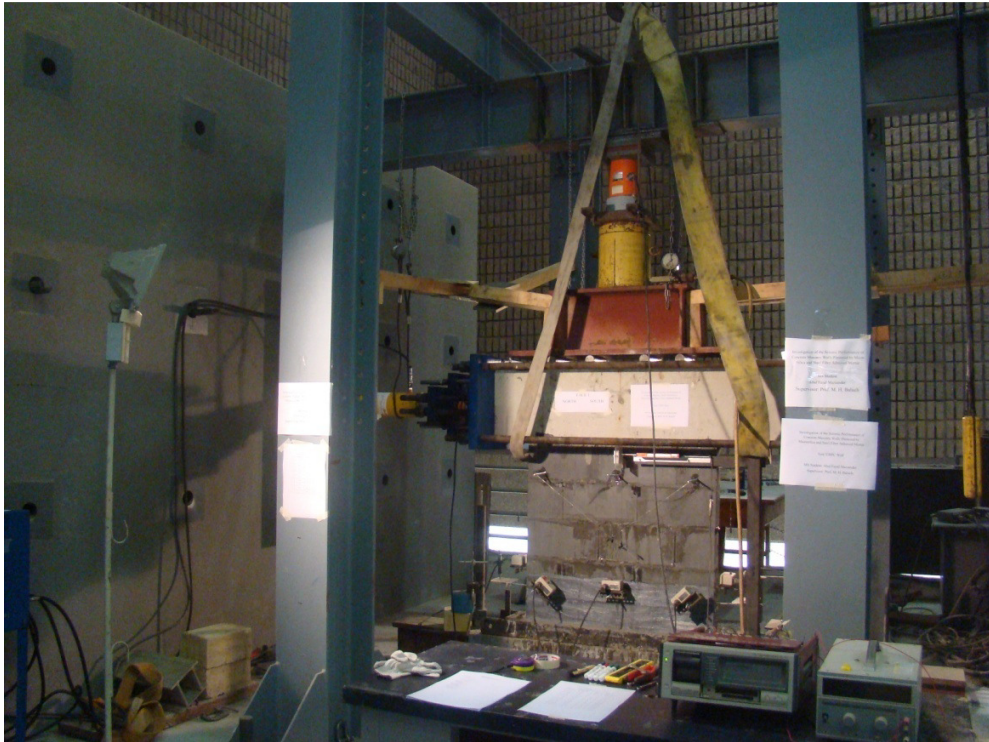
Cyclic Test Setup for HPCMW Wall
